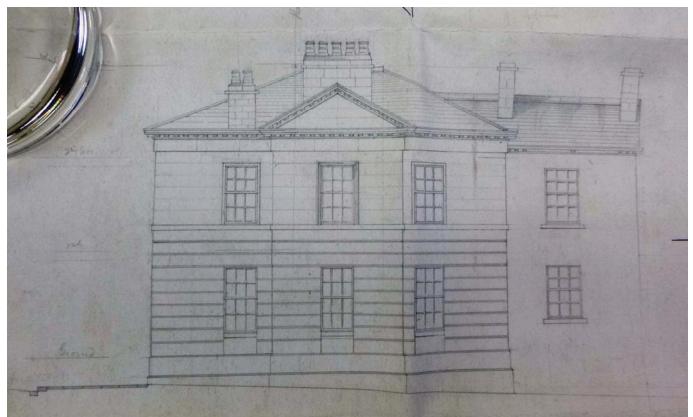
Proposed south elevation of the council buildings, dated c1903 (CAC(B) Z/1028/1 c1903)
